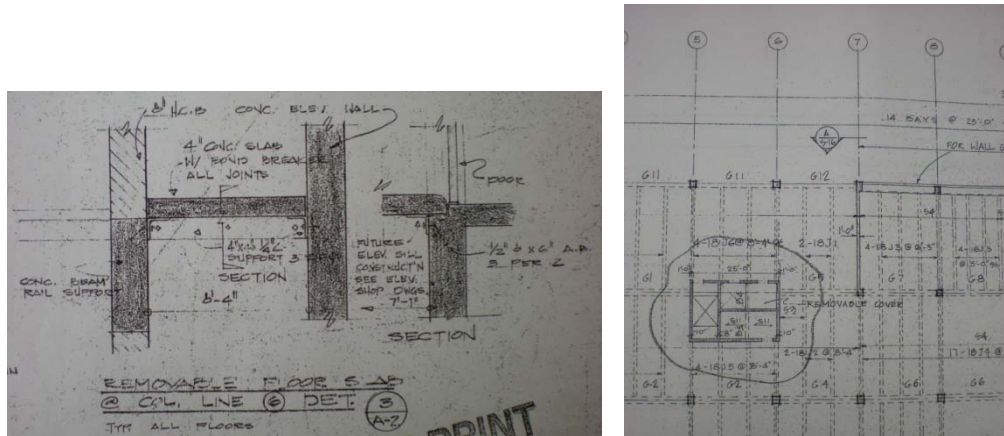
Architectural & Structural Drawing of Removable Floor Slab for Second Elevator³¹⁴
